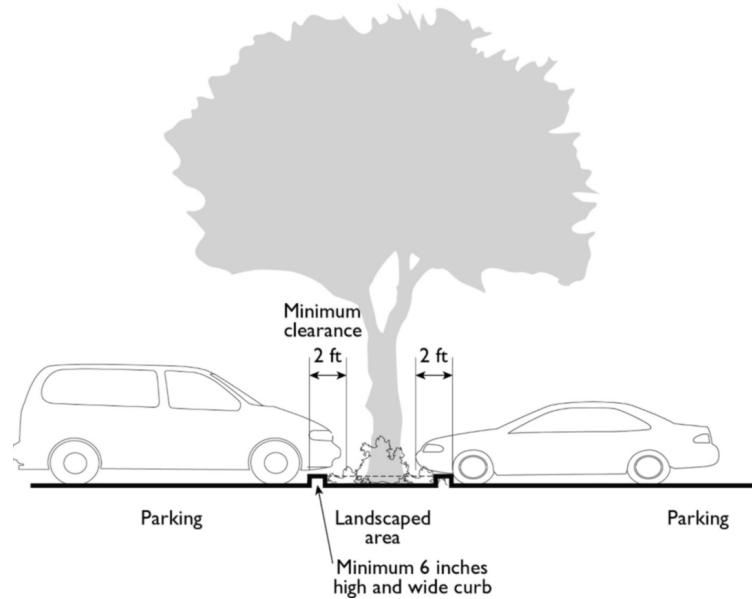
N: PARKING LOT LANDSCAPING
